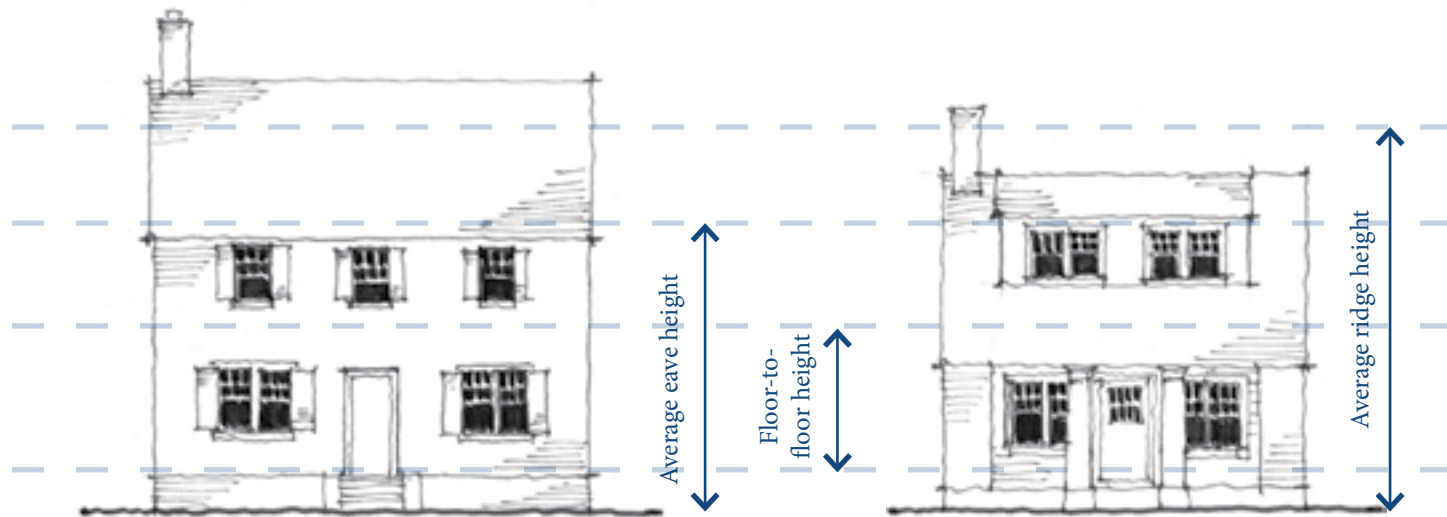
Typical cross-street section. Note that the house on the left has an entry on the cross-street and the house on the right has a side addition (potentially a side porch) facing
